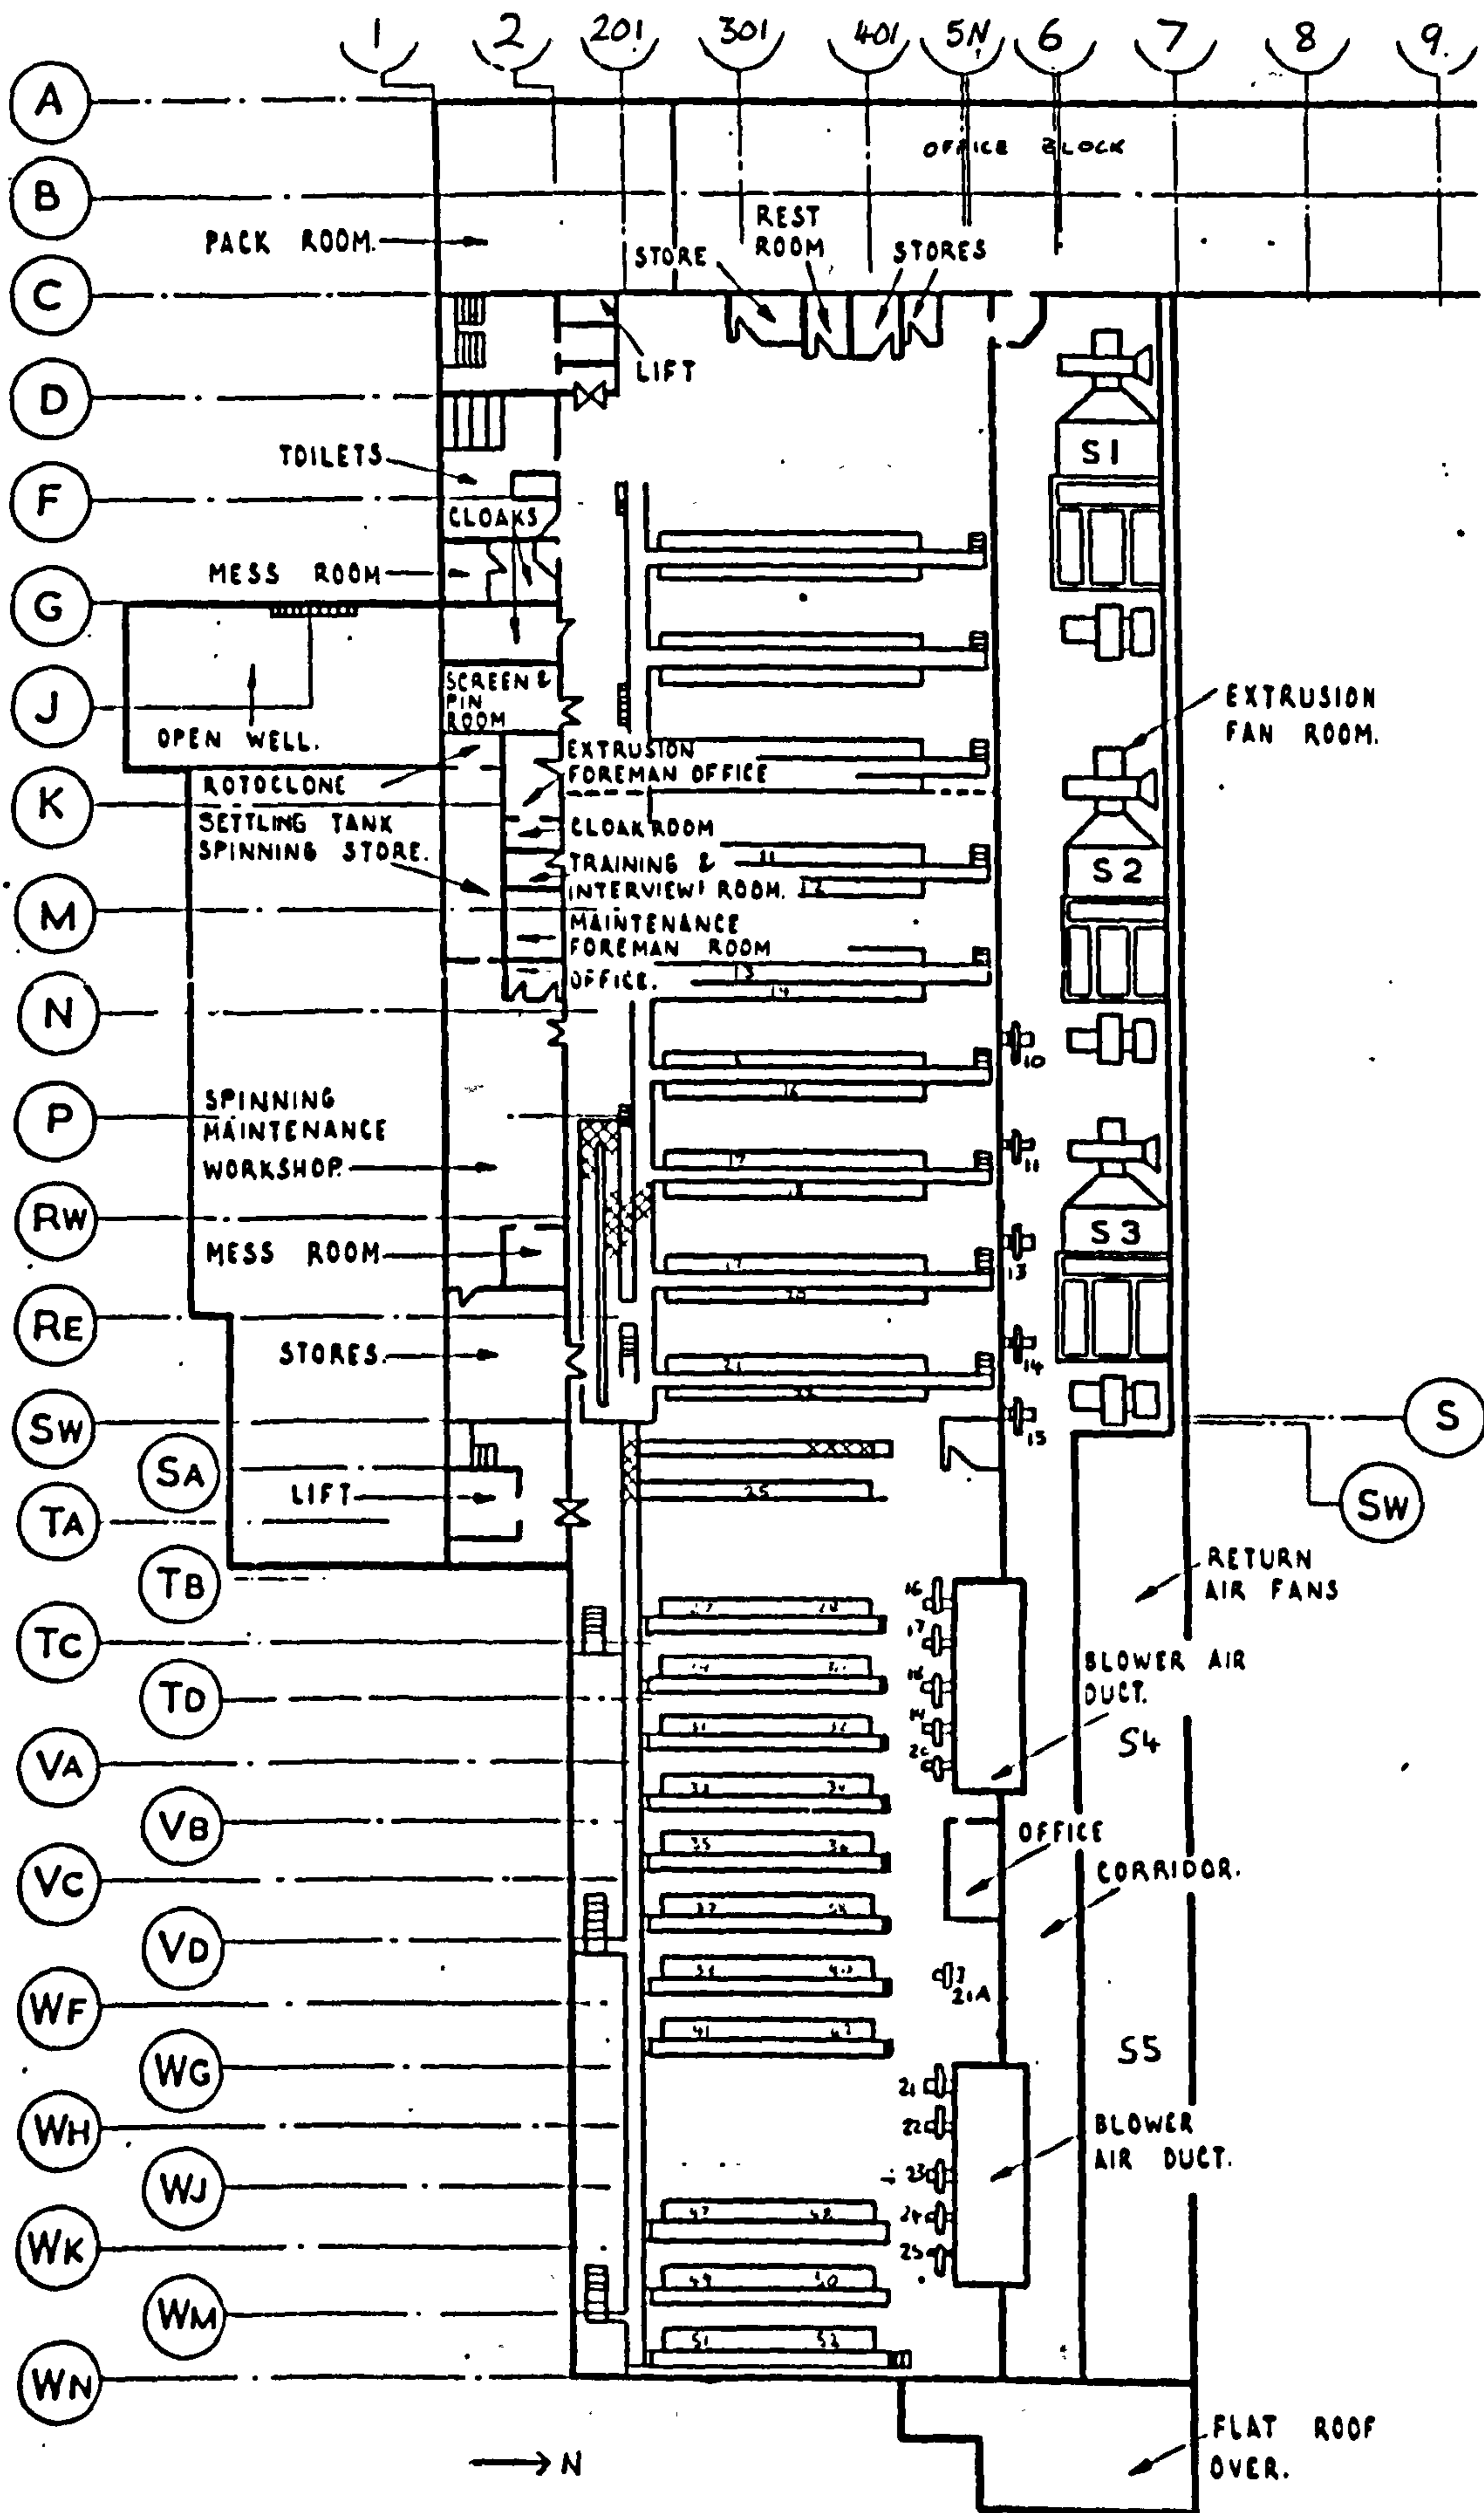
FIRST FLOOR PLAN (EXTRUSION)
